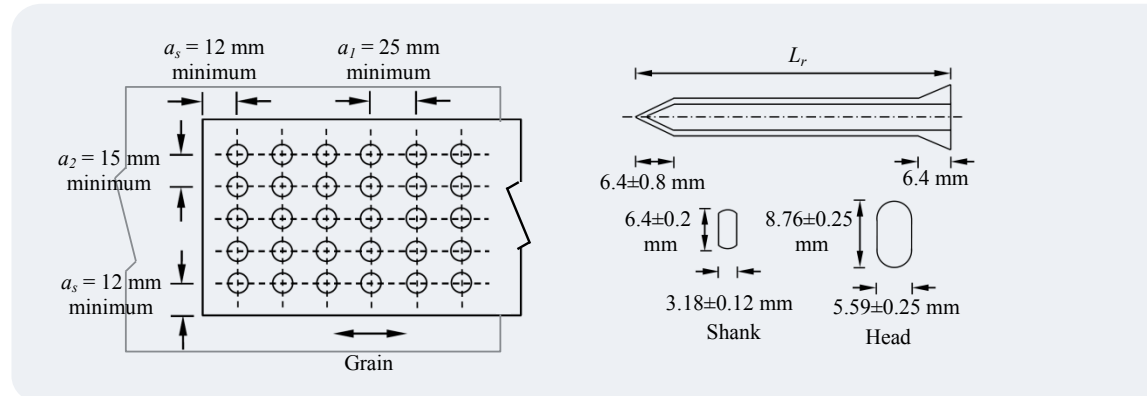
Timber rivet joint: rivet details (left); and typical steel plate configuration (right).
